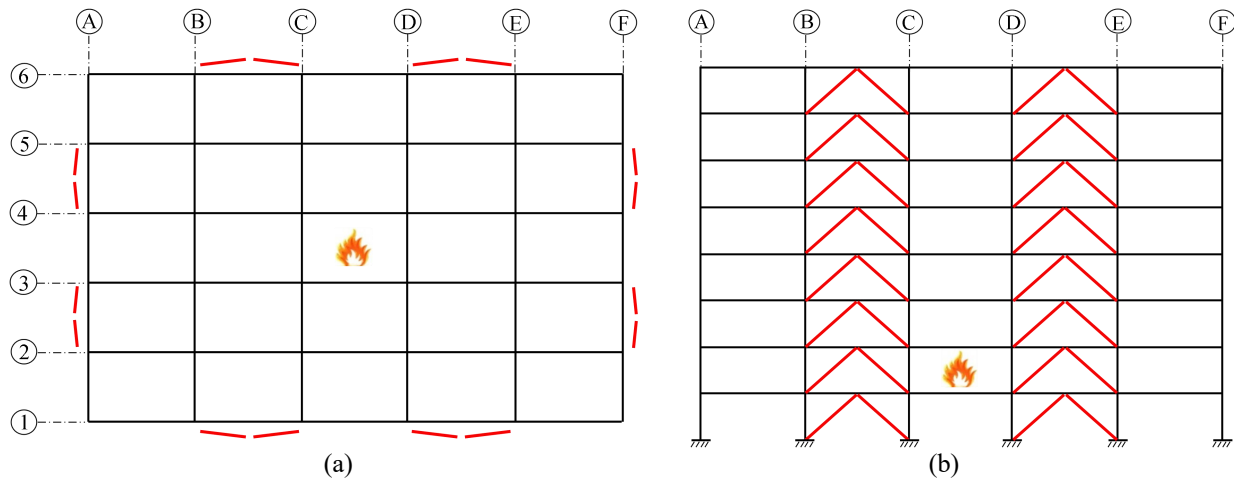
Layout of vertical bracing system: (a) plan view; (b) elevation view
